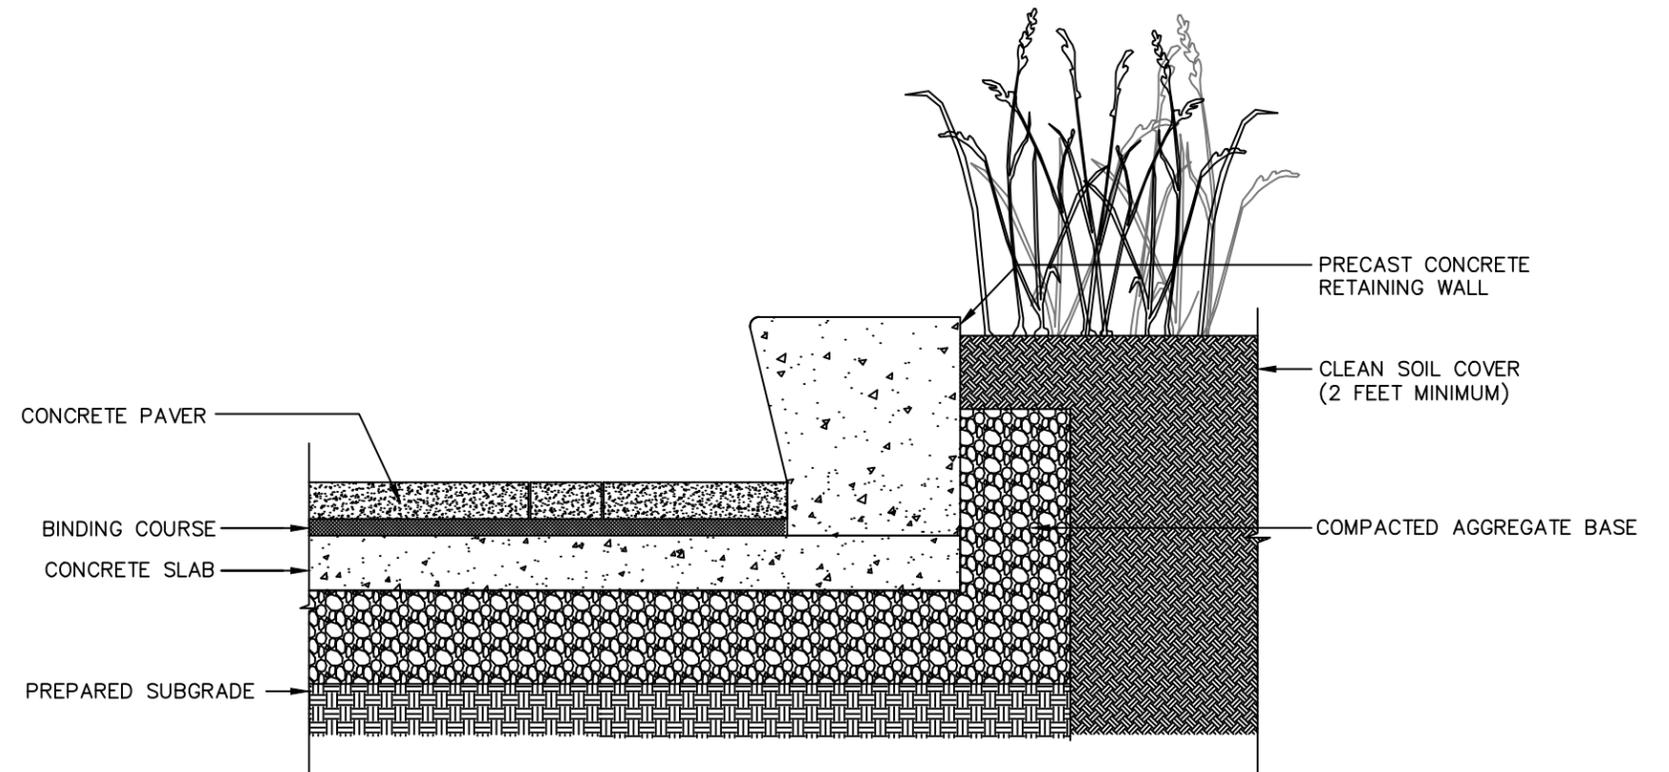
TYPICAL ROADWAY AND SIDEWALK
